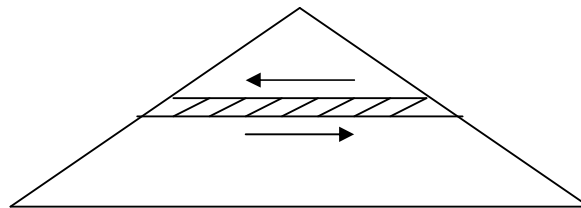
Dam Section in Shear Beam Analysis (Shunzo, 1984).
